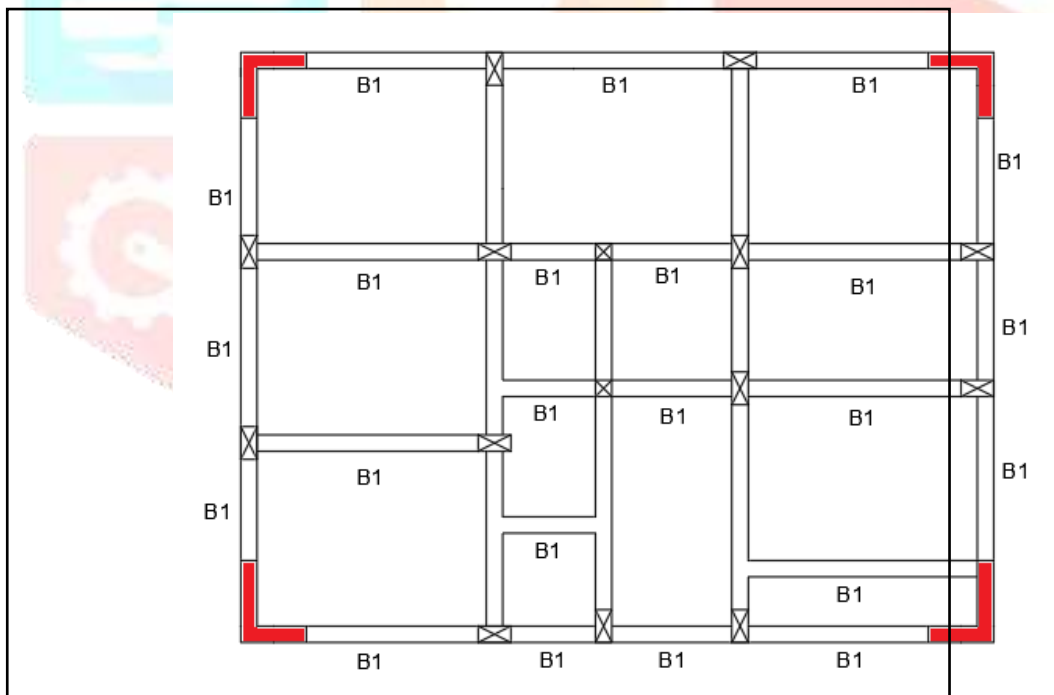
Shear Wall at Corner along Periphery of Structure in L Shape plan in AutoCadd
